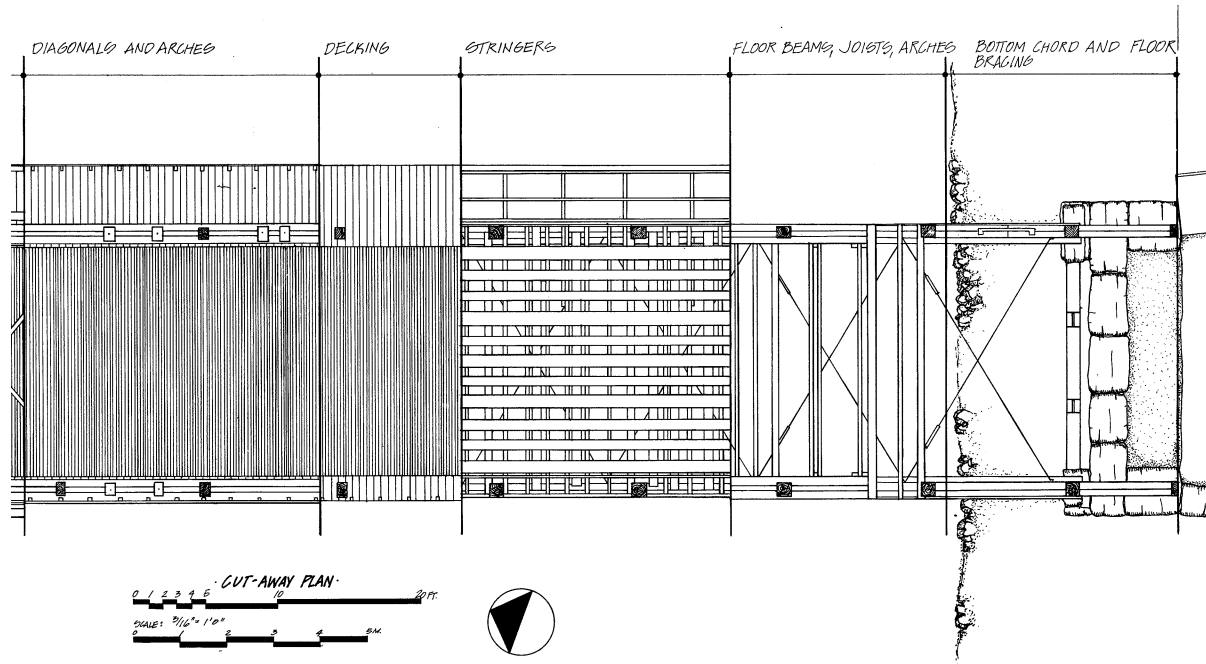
Partial Floor Plan of Barrackville Bridge (HAER, 1973)
